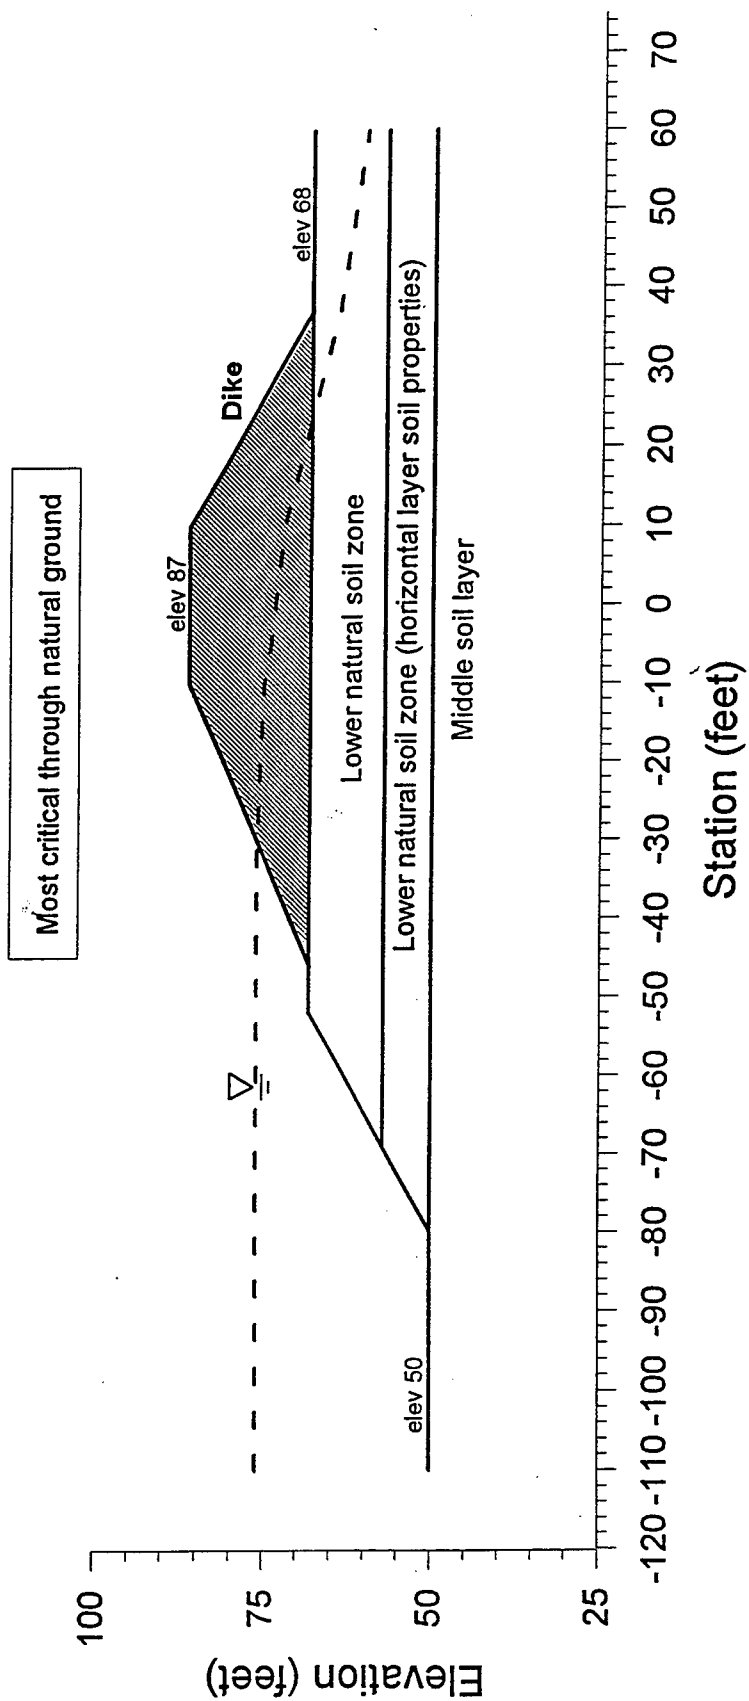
Section 1, as idealized, embankment on natural foundation deposit
